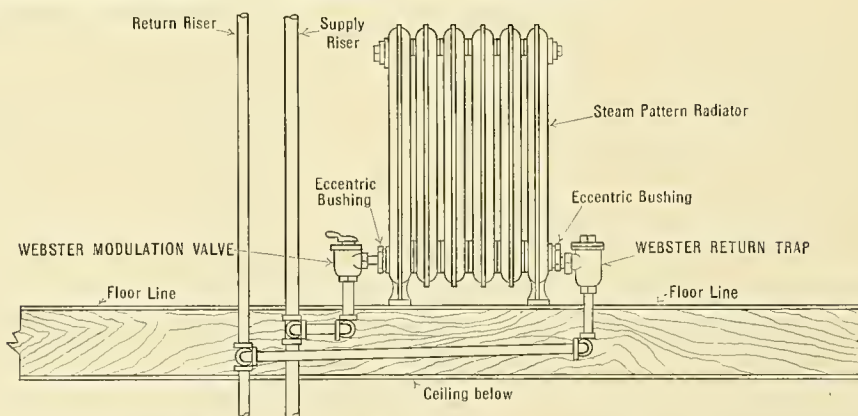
Arrangement of connections to a steam-type radiator where the branch run-outs are in the floor construction
